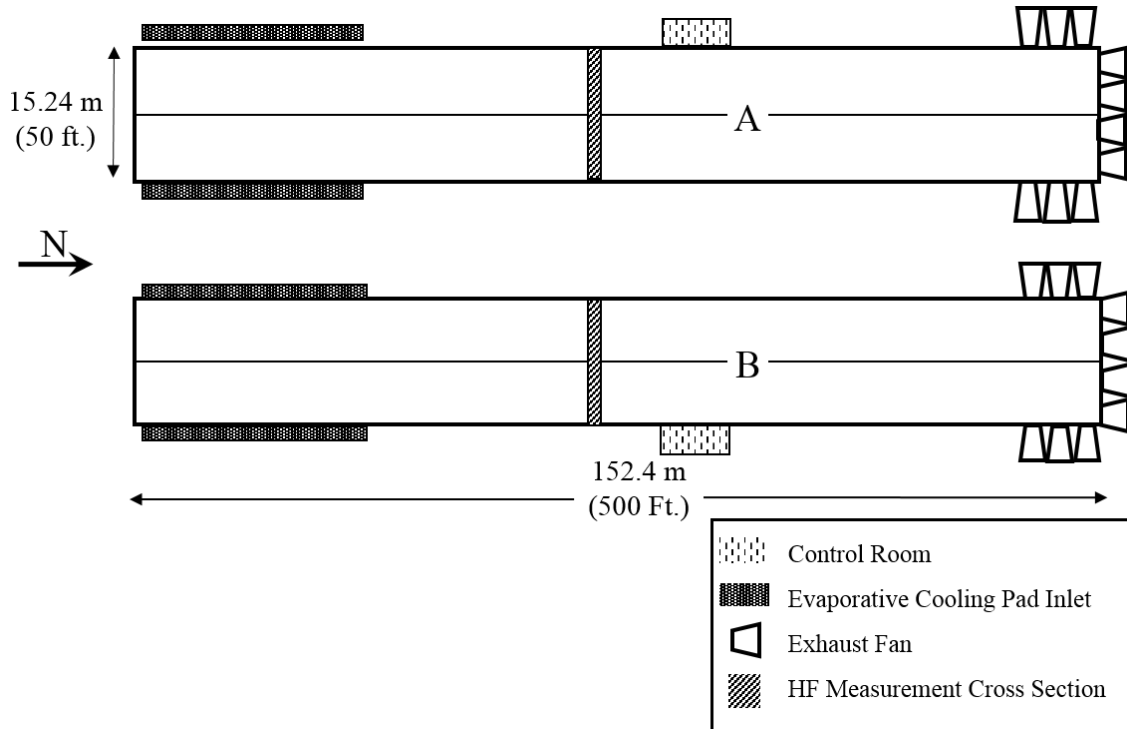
Test house schematic illustrating cross sectional measurement locations for House A and B.
